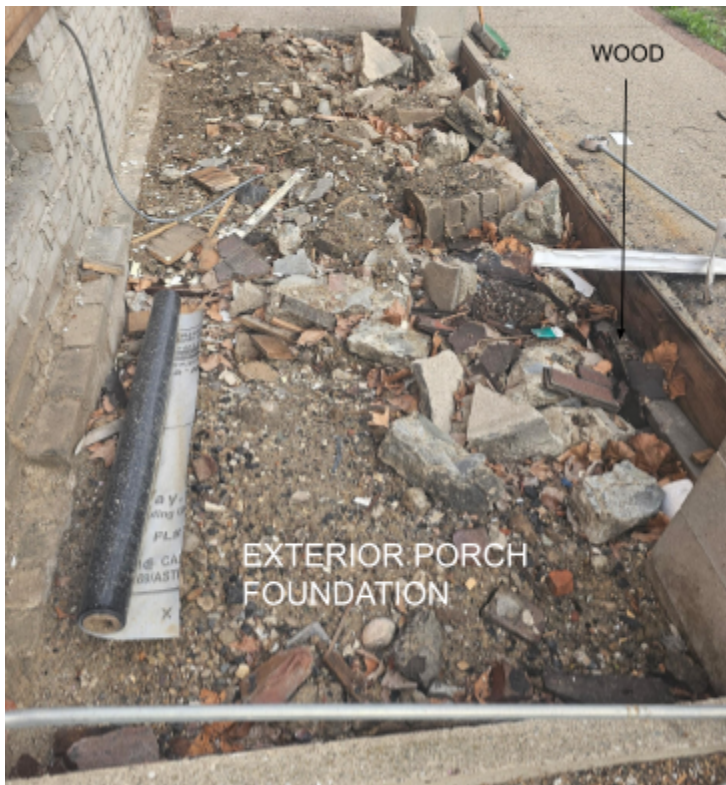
Rear office Foundation photo by w/Purpose
